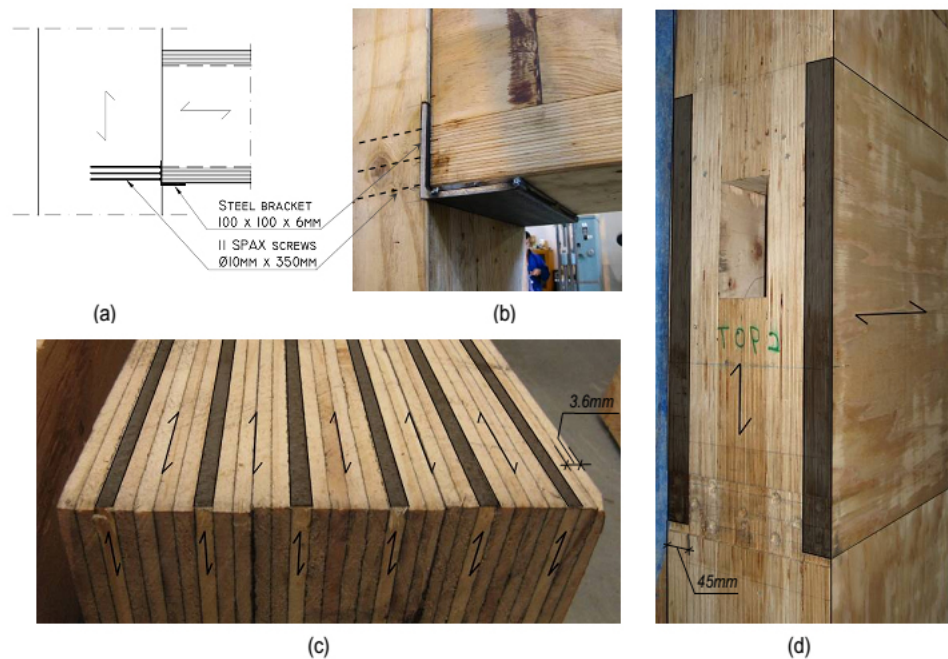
Joint reinforcement (van Beerschoten, 2011) including:
